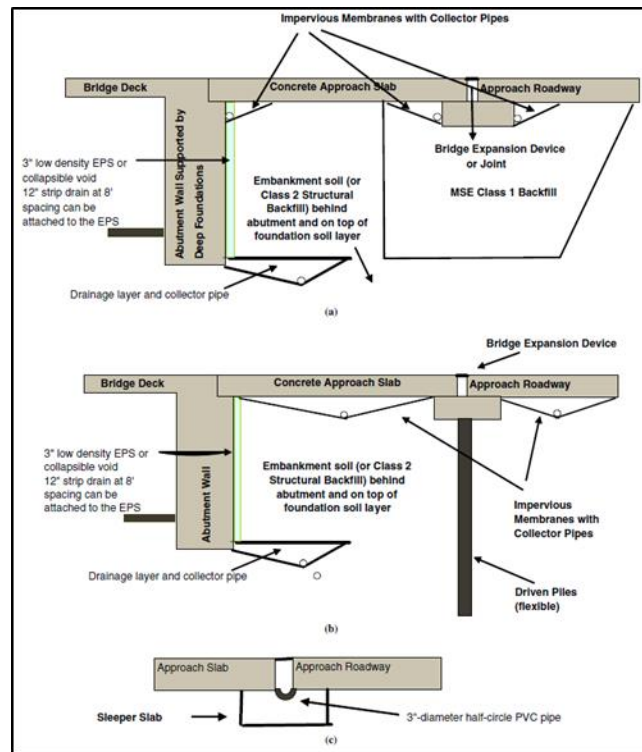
Recommended Supporting Systems and Drainage Details for Sleeper Slab: (a) Placement of MSE Wall under Sleeper Slab, (b) Use of Class 2 Backfill and Driven Piles to Support Sleeper Slab, and (c) Placement of Gutter and Half-Circle PVC Pipe to Drain Water (Abu-Hejleh et al. 2008)
